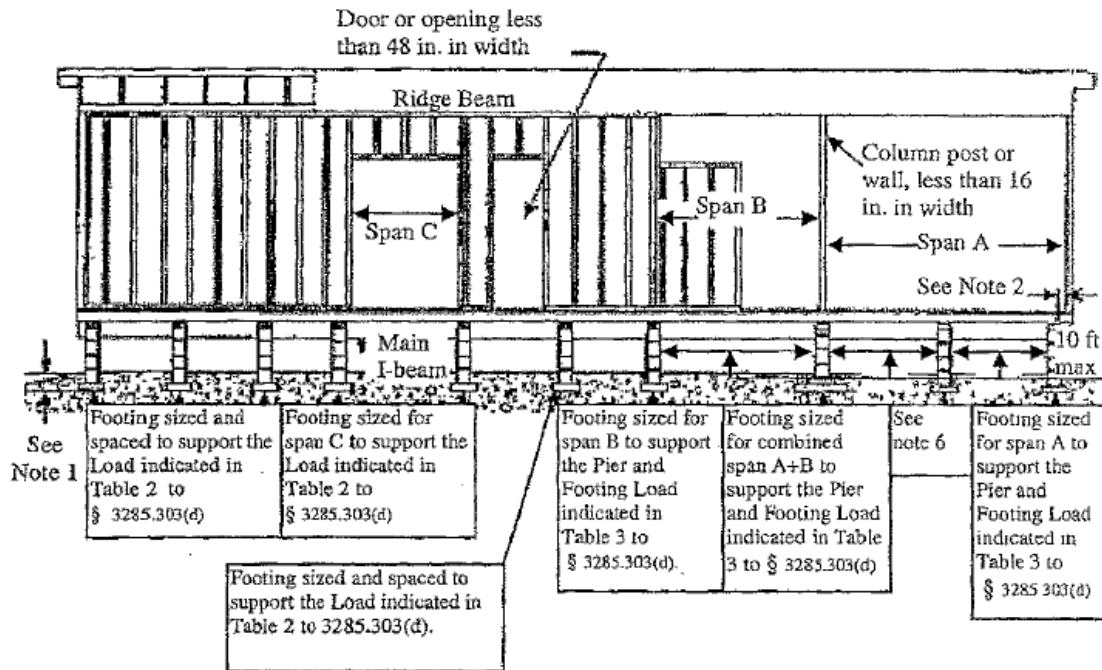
Typical Mate-Line Column Pier and Mating Wall Support when Frame Only Blocking is Required.
